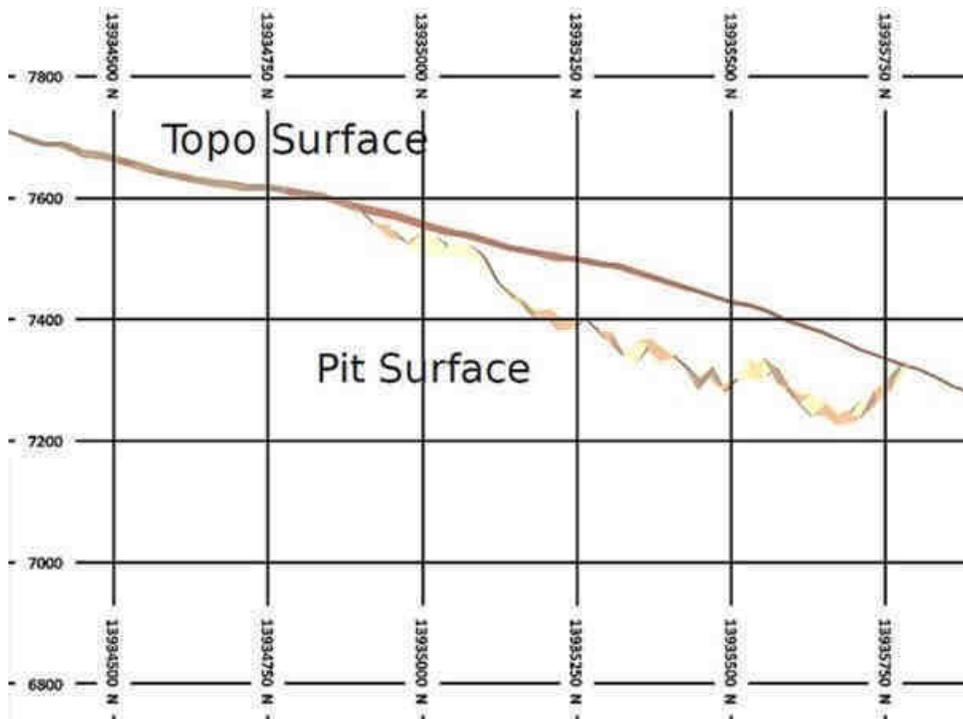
Section Through Pit Looking West (scale as indicated)
